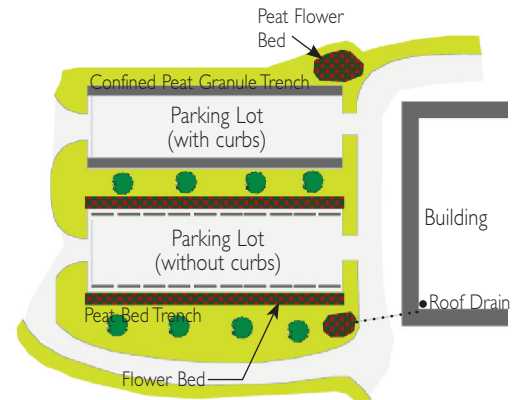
Bioswales within parking lots can collect stormwater and break up large areas of impervious pavement.
